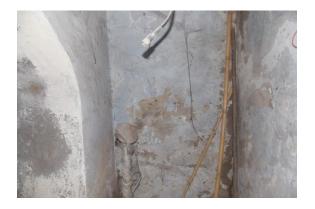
Dampness/Seepage on Wall No. 1, 2 & 4 of Passage No.1 of Ground Floor
